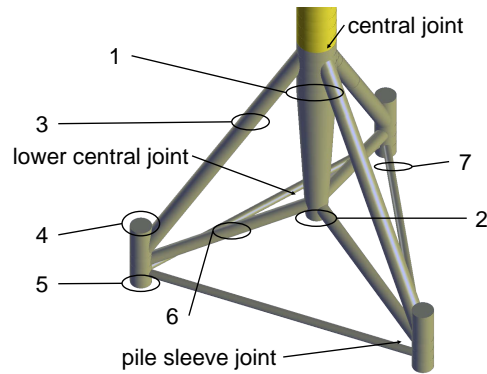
Tripod substructure and positions where cross sectional properties are provided (cf. Table 4.5).
